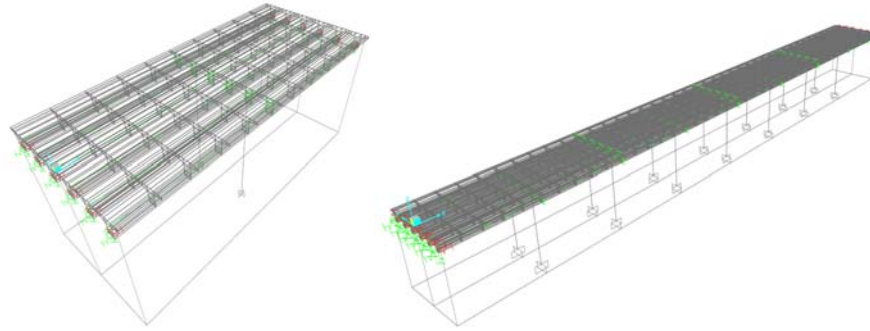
SAP2000 bridge model for 2-span and 8-span prestressed bridge, respectively
